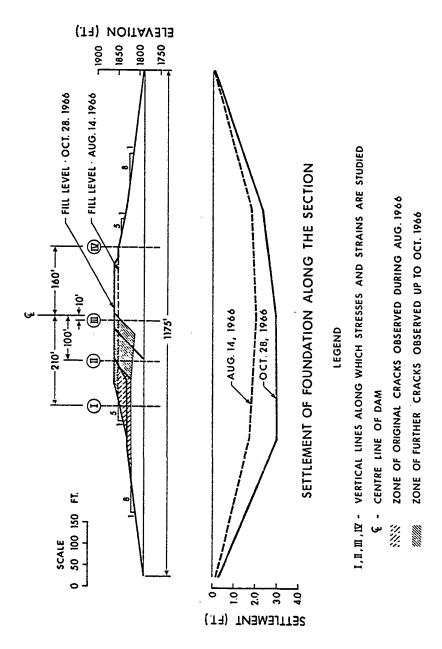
SECTION OF DAM AT A DISTANCE OF 440 FEET FROM LEFT ABUTMENT SHOWING APPROXIMATE ZONES IN WHICH CRACKS DEVELOPED PROGRESSIVELY
